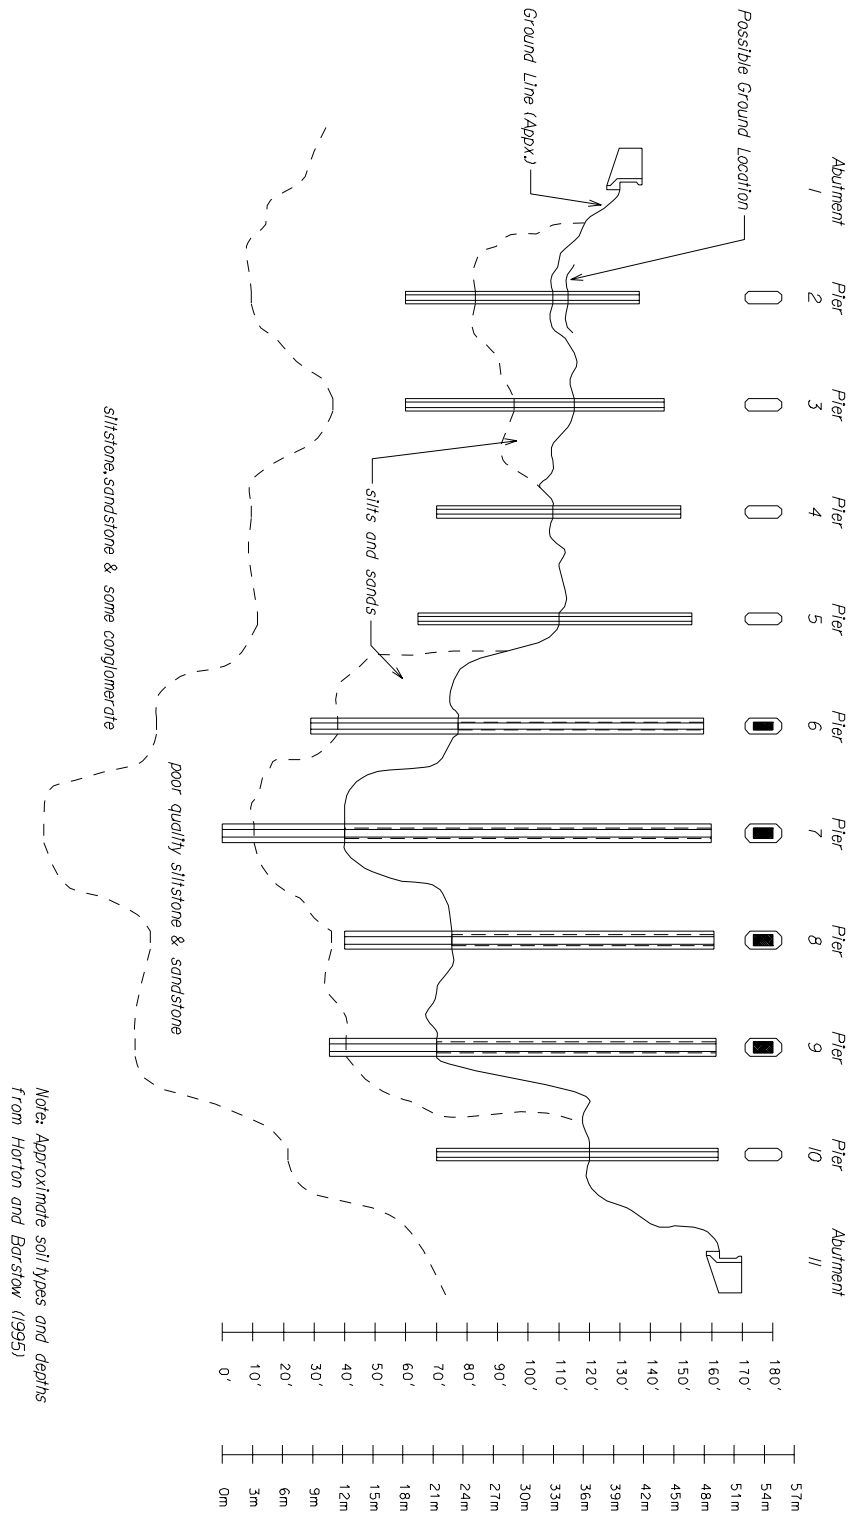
Column Heights, Cross Section, and Soil Layers
